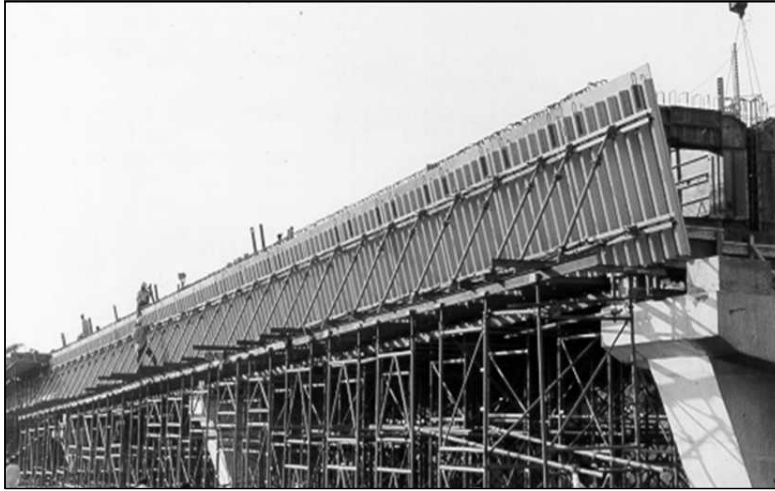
Formwork Arrangement for Web of Box Girder.
